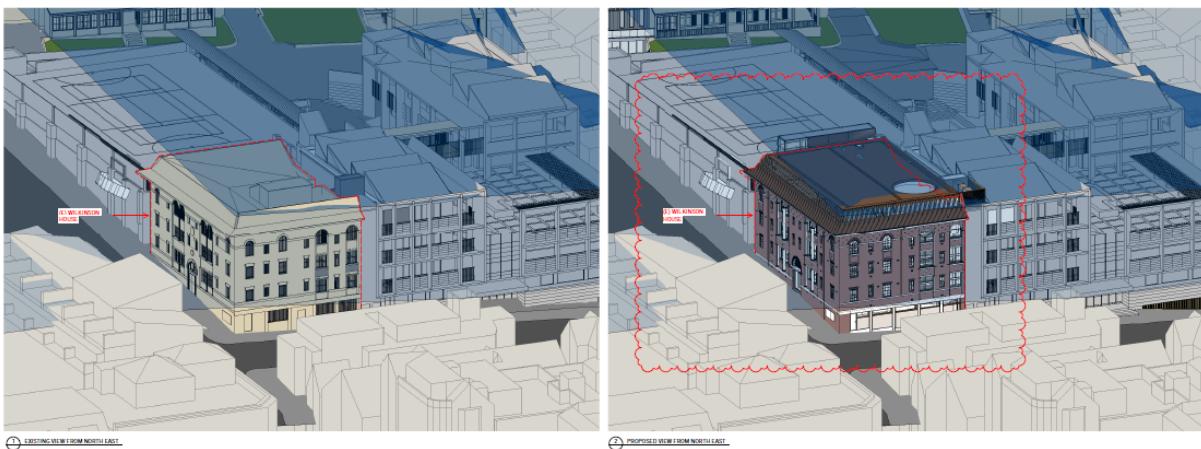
Existing (left) and proposed (right) view from north east toward Wilkinson House
